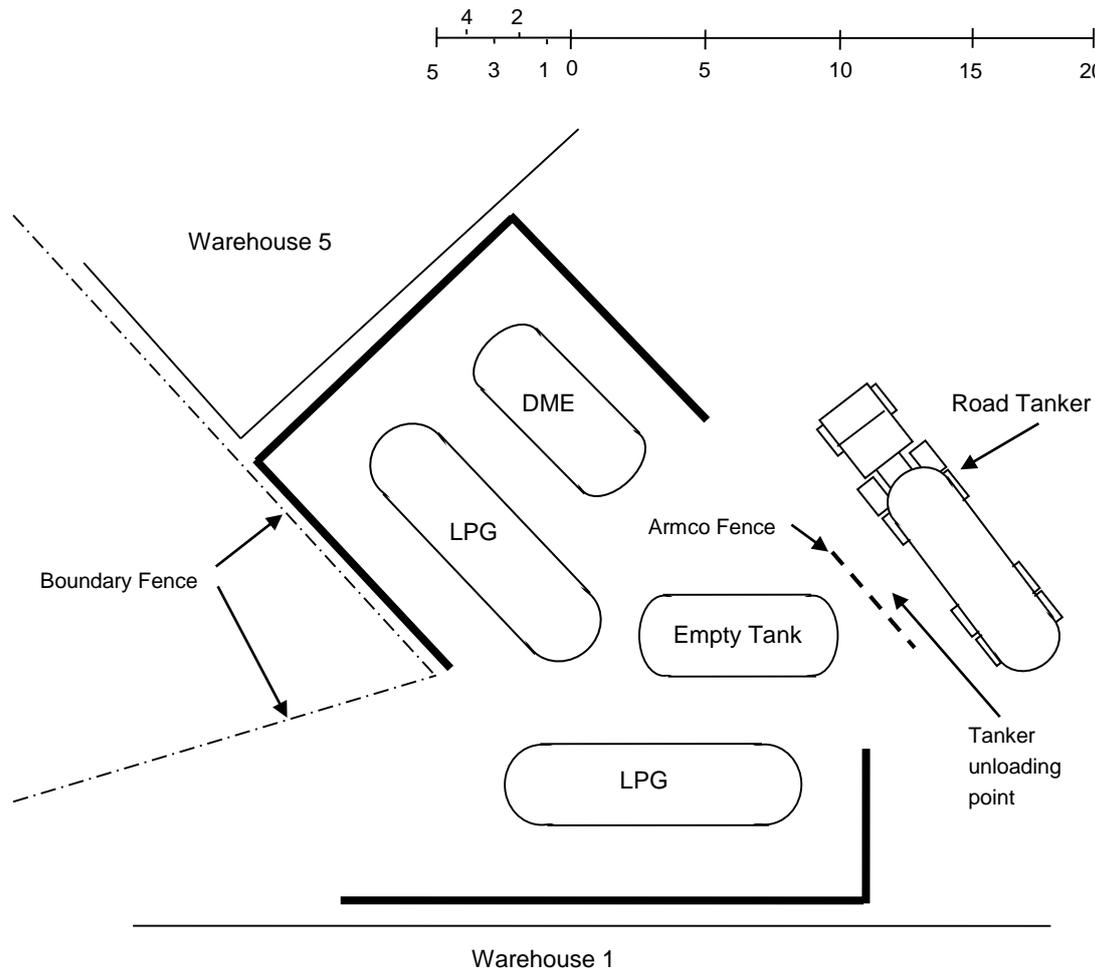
Proposed LPG Storage Area Layout Schematic – MMP Site
